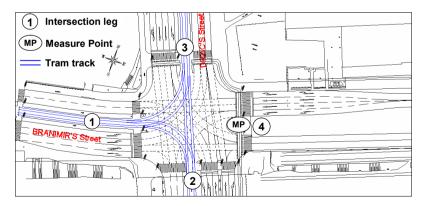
Branimir - Drziceva Intersection after the reconstruction.
